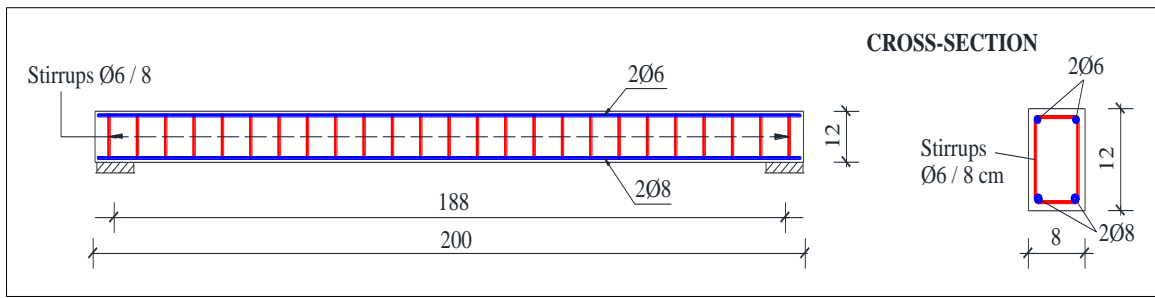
Geometry and reinforcement layout of beam specimens (dimensions in cm)
